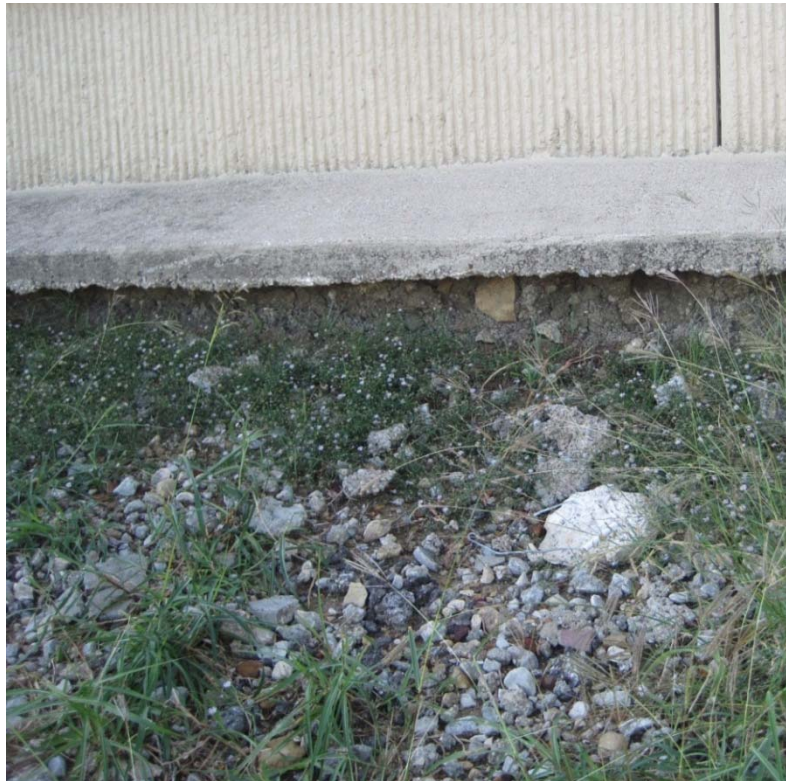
Localized Erosion at Toe of Wall (~4ft width)
